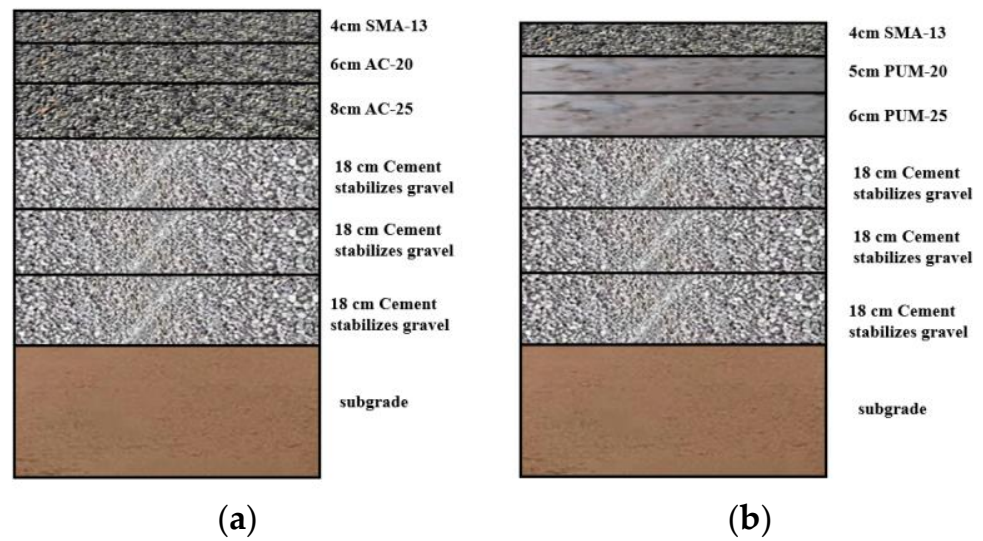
Schematic diagram of the two pavement structures. (a) Typical pavement structure. (b) Composite pavement structure.
